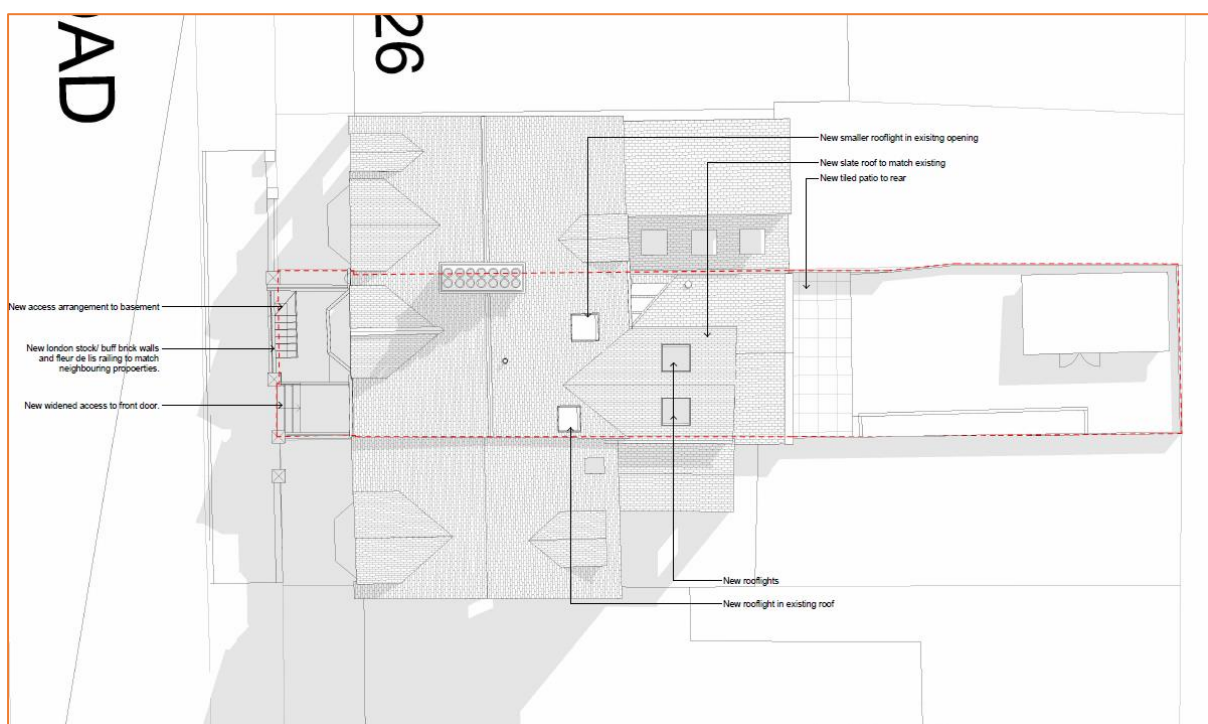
Proposed Roof Plans (Source: Gresford Architects)
